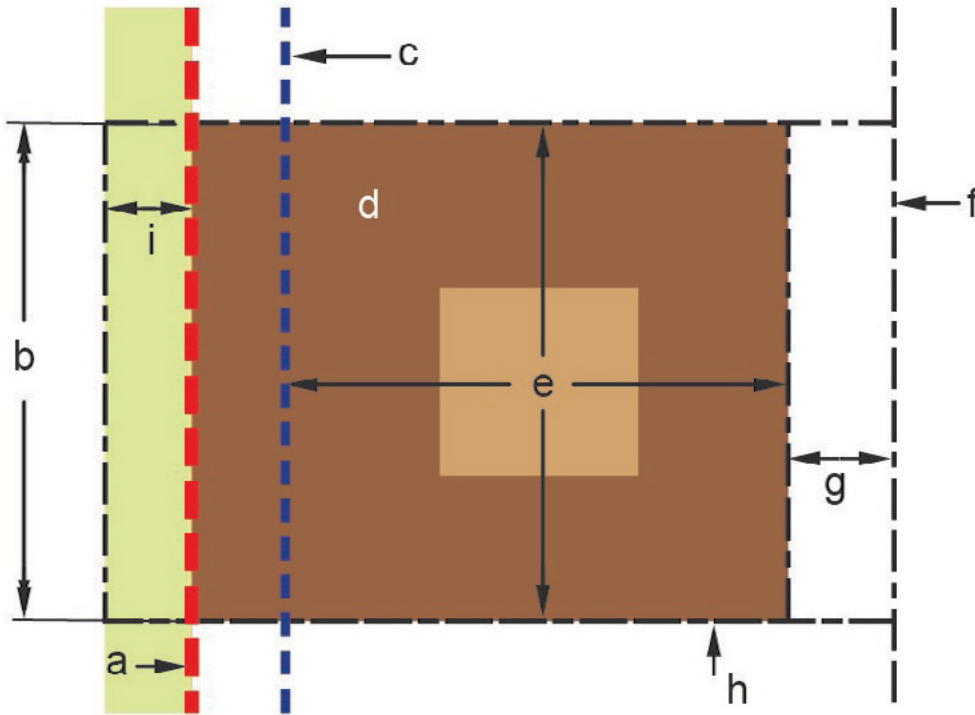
AK: Urban Medical Flex Site and Building Placement
